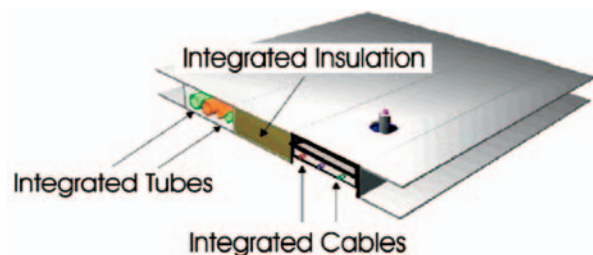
Example CAD panel equipped with some outfit elements [3] .
